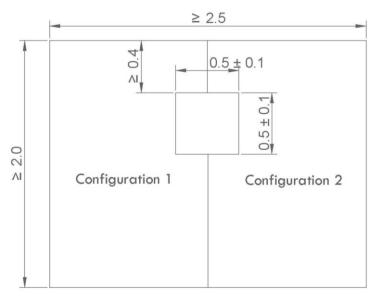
Example of hygrothermal behaviour test specimen with one opening (dimensions in metres).
